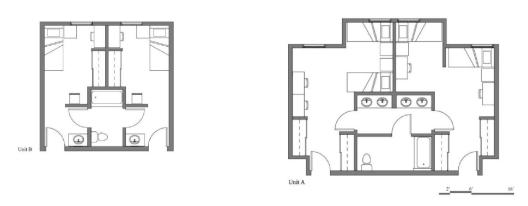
Shasta Hall Unit Plans: double rooms sharing a bathroom (above), single rooms sharing a bathroom (below)
